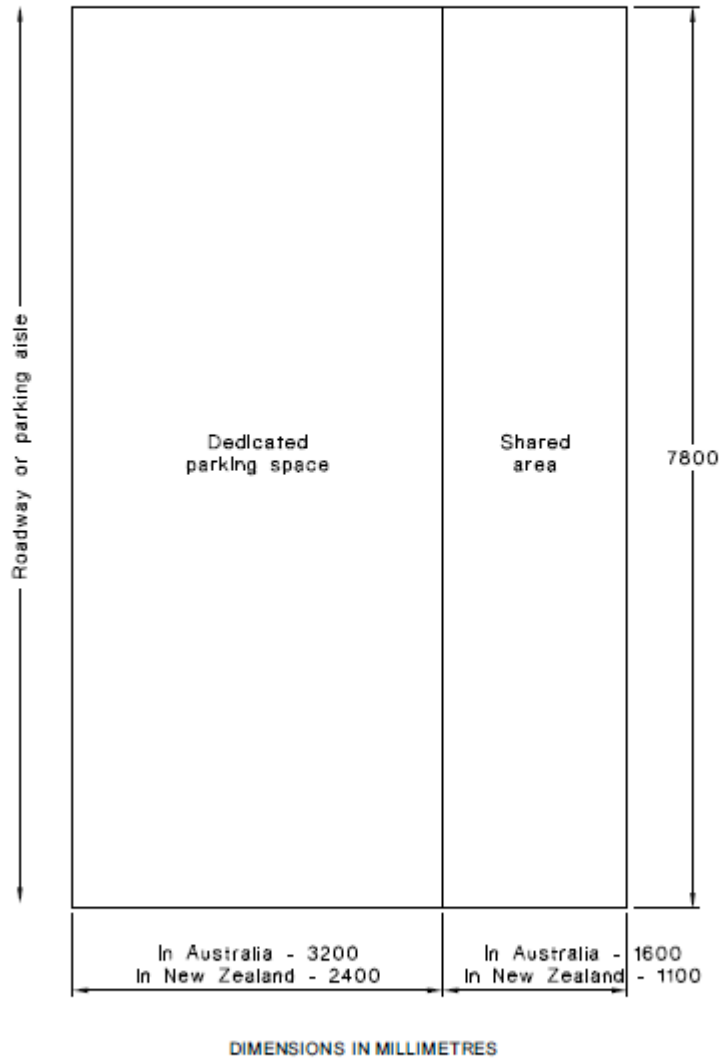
TYPICAL DIMENSIONS OF PARALLEL PARKING SPACES
